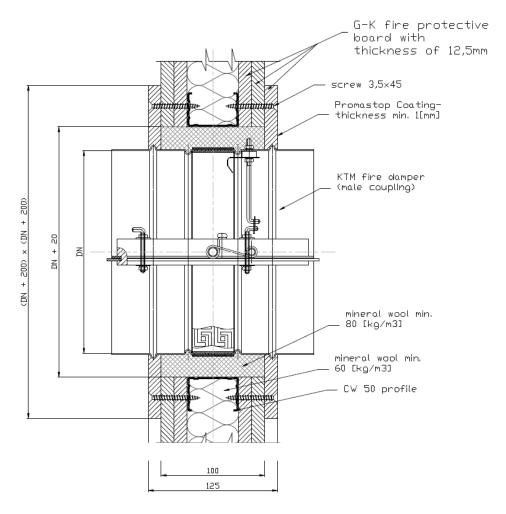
Installation of KTM fire damper (male coupling) in light wall barrier
